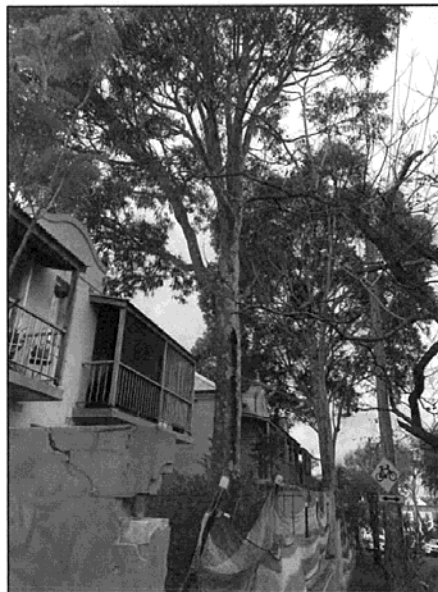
Damage to retaining wall. Showing Tree 2 & 3.
